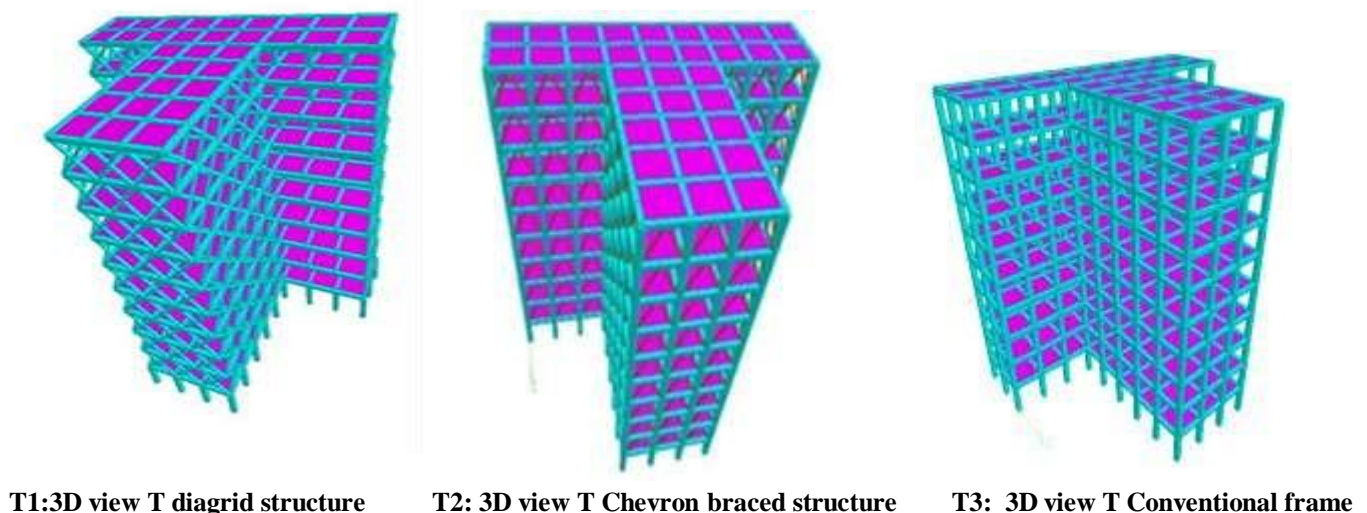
3D Rendering view of T Base plan structures in STAAD Software
